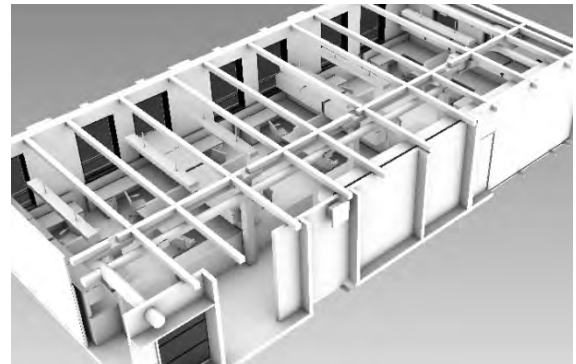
Specific zone on 5th floor of building, showing air handling units, windows, cubicle layouts, etc. obtained from the building information model.
